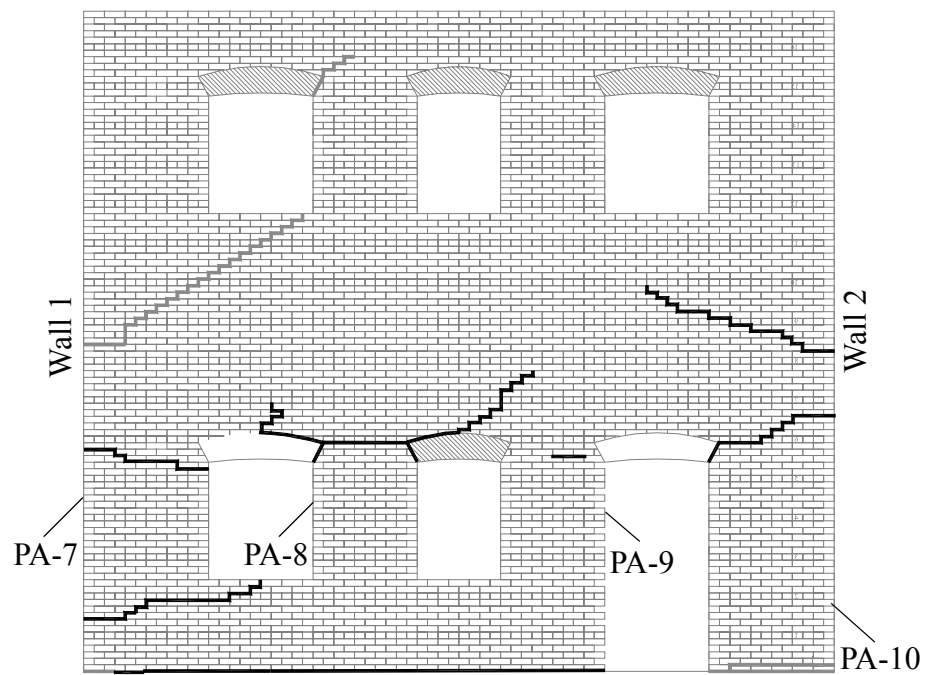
Crack pattern in Wall A following Test Run 19.
